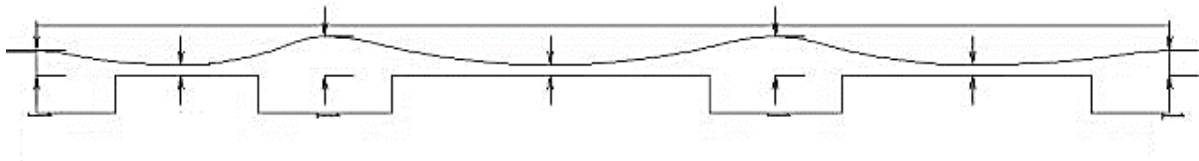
ELEVATION OF A TYPICAL BANDED TENDON
